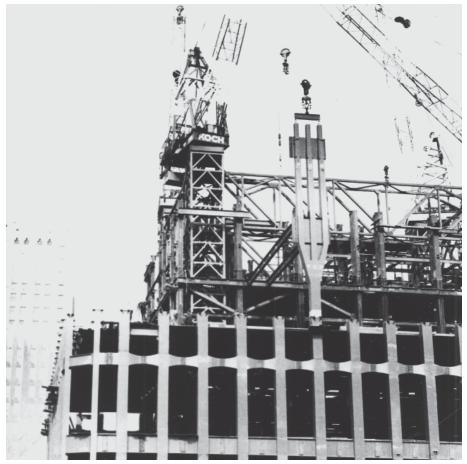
Former World Trade Center load bearing wall © CTBUH Ramsey Collection
